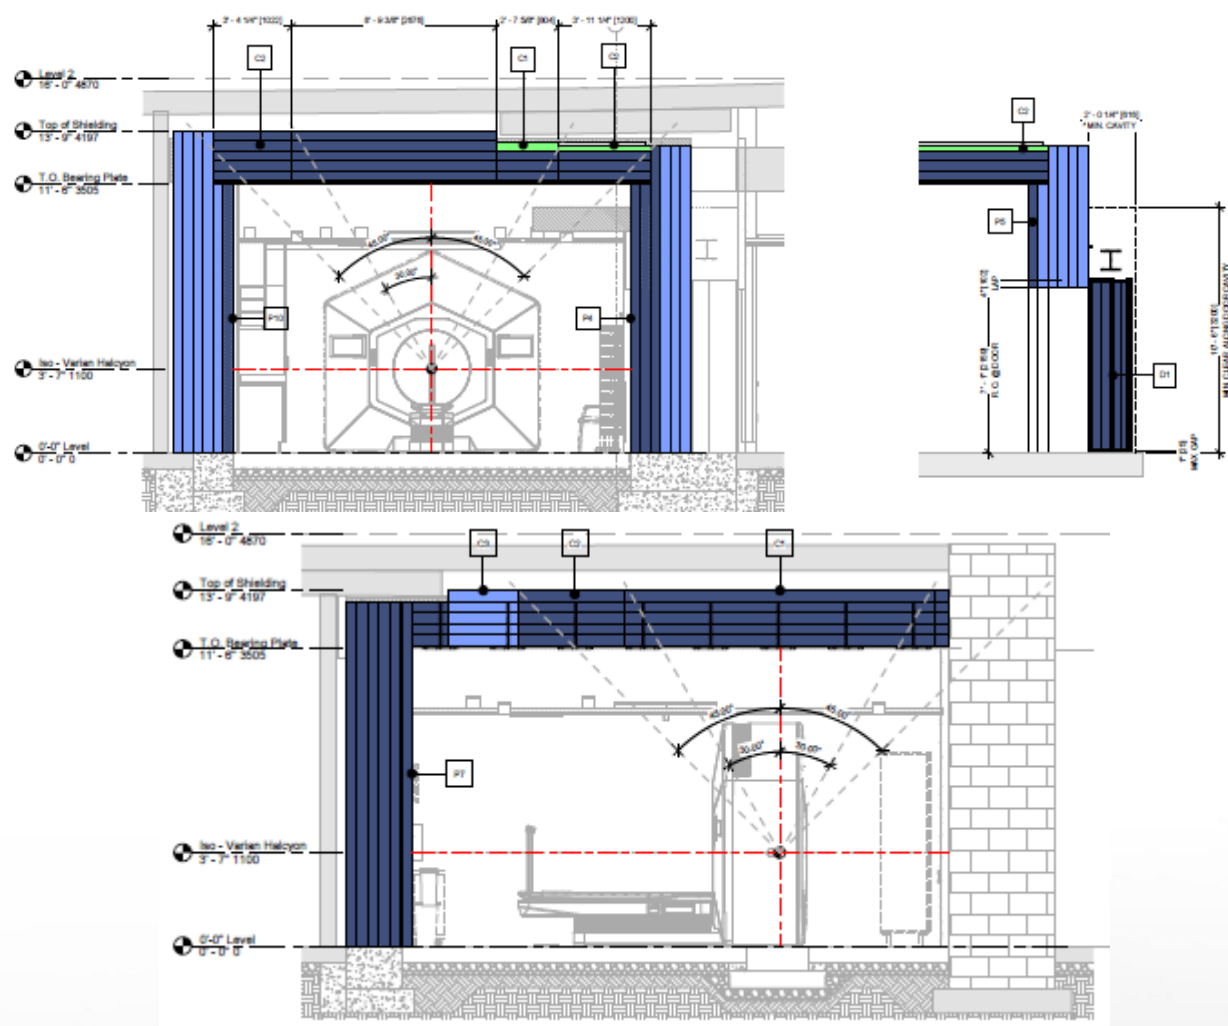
Layout of a vertical sections showing doors of the treatment rooms (room 1 on right, room2 on Left)
